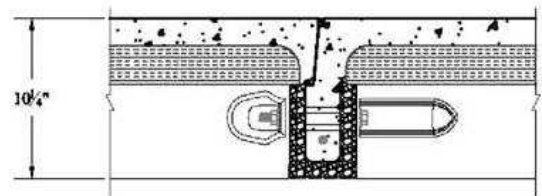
TYPICAL BEAM POCKET DETAIL
